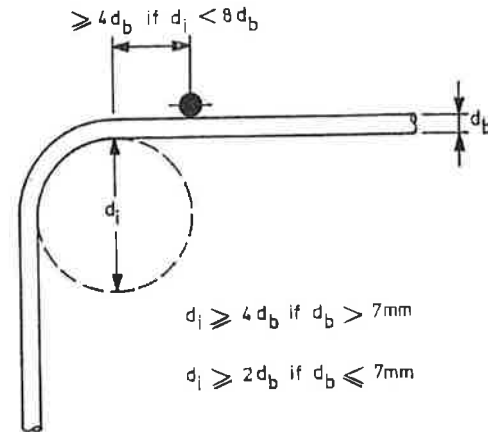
BENDS IN WELDED WIRE FABRIC FOR STIRRUPS AND TIES
